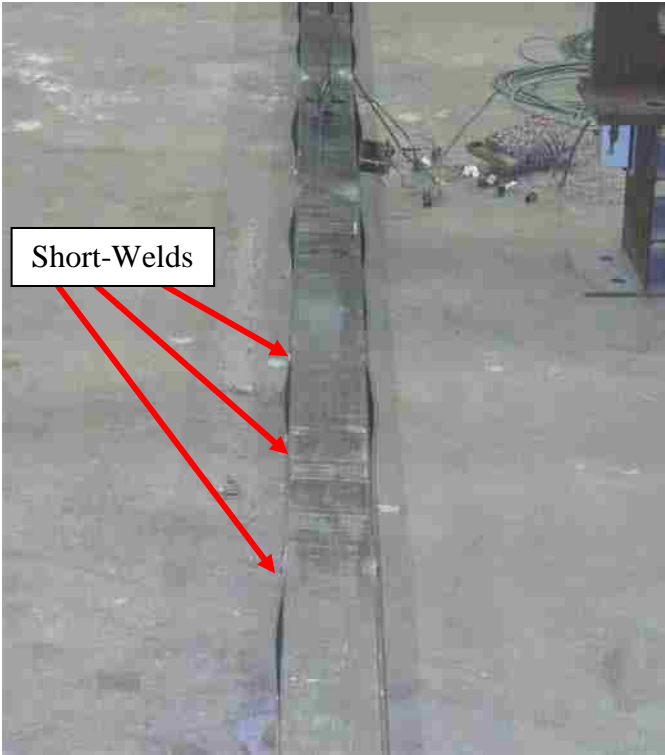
Photo of Local Buckling in “Adhesive and Welds” Column During Test to 20 kips
